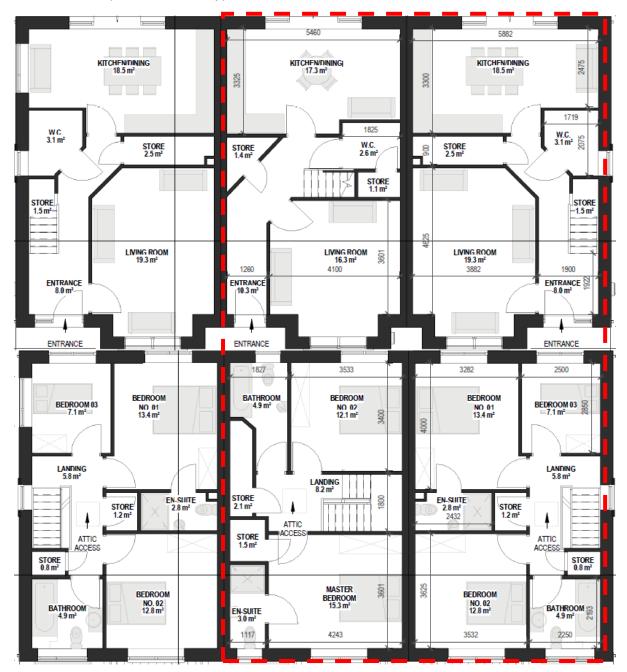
Typical ground floor plan of House Type 5.4 (top) and typical first floor plan of House Types 5.4 (bottom). The area within the red dashed line represents the ground and first floor plans for House Types 5.2-5.3.
